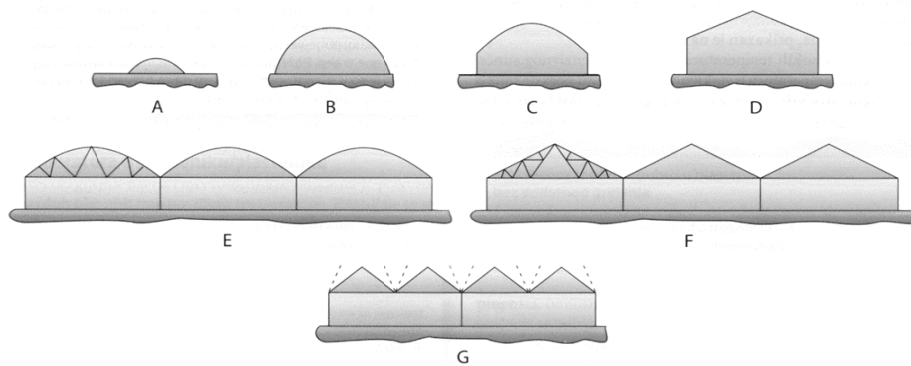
Type of greenhouse construction included in the model (A – low tunnel, B – high tunnel, C and D – single greenhouses, E, F, G – multi-span greenhouses) (Martinov et al, 2006)
